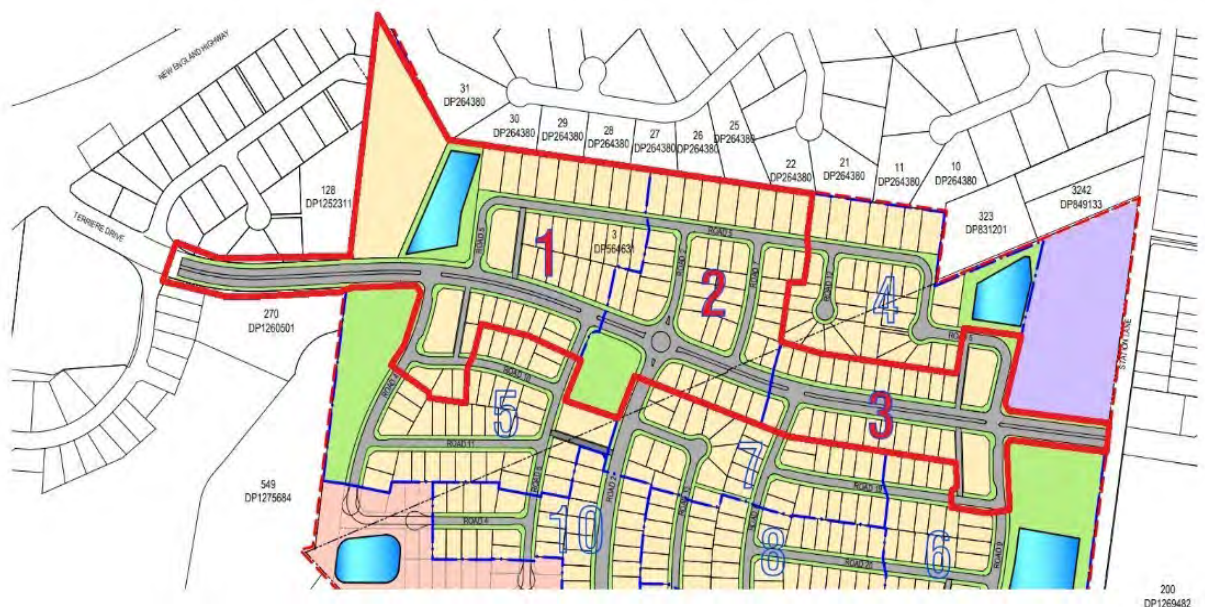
Proposed subdivision layout showing Stages 1 – 3 (112 lots)
